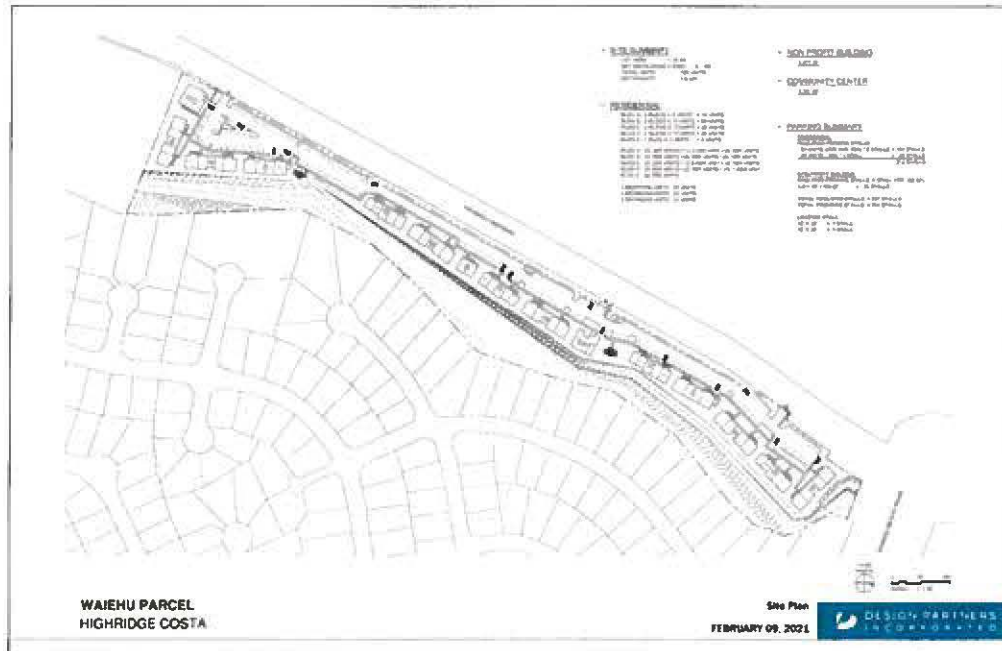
Concept site plan for proposed project (Design Partners Incorporated 2021)
